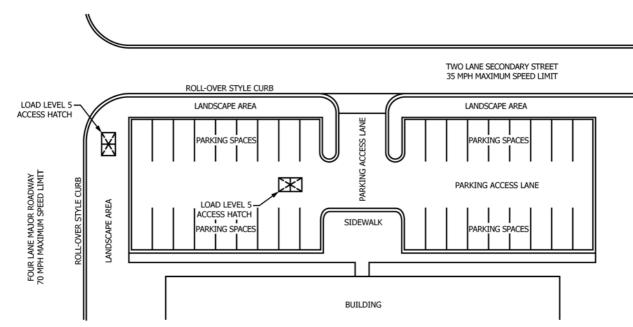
Plan Showing Appropriate Locations for Load Level 5 Access Hatches—Off Street Truck Traffic
